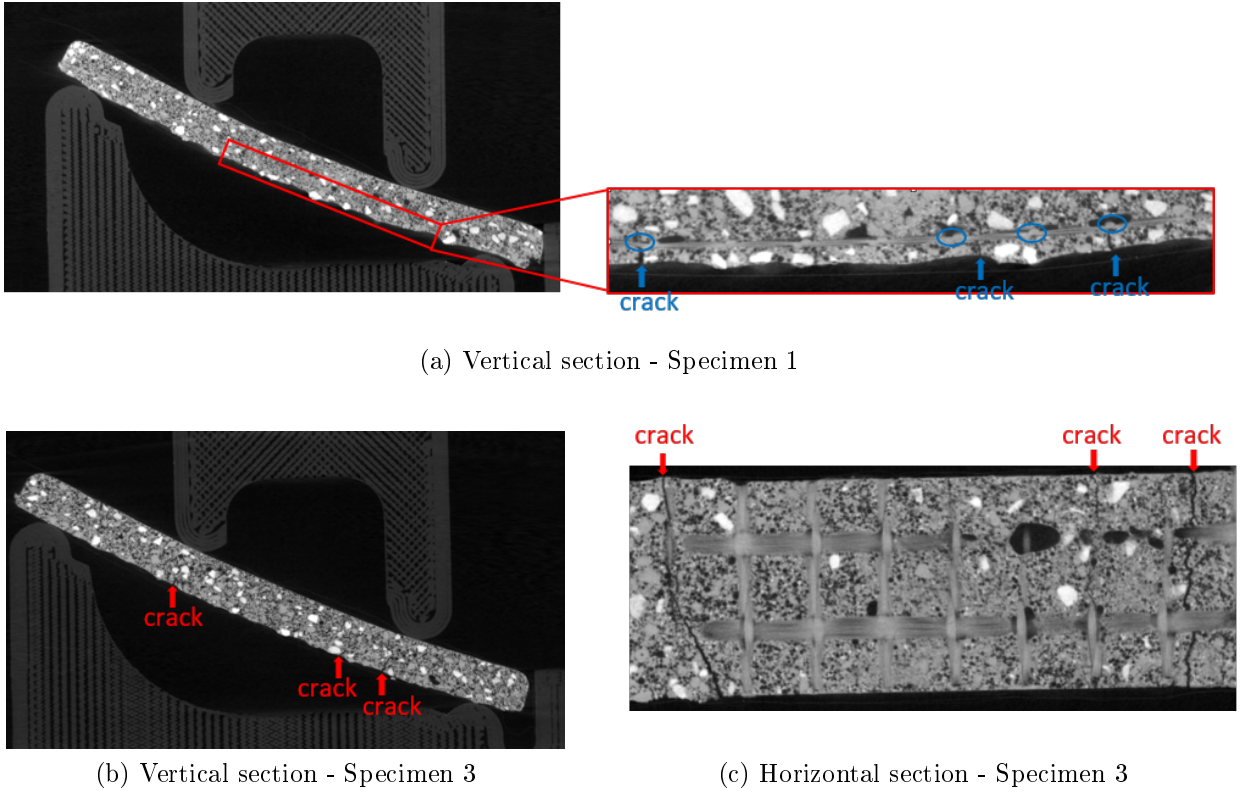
Sections inside the reconstructed volume of the cracked M1-We-1 samples: (a) vertical section - Specimen 1, (b) vertical section - Specimen 3, and (c) horizontal section - Specimen 3.
